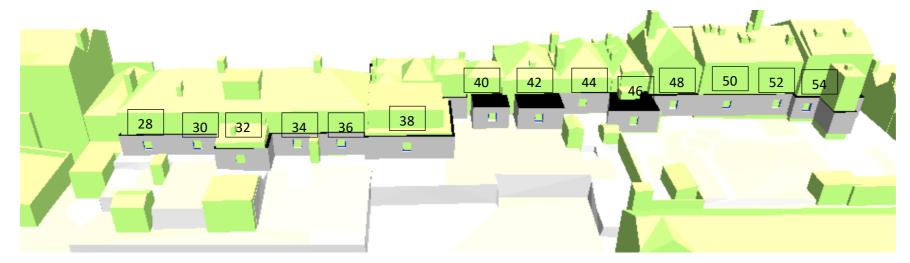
Indicative Window Locations assessed for adjacent dwellings at Montpelier Hill North of Proposed Development
